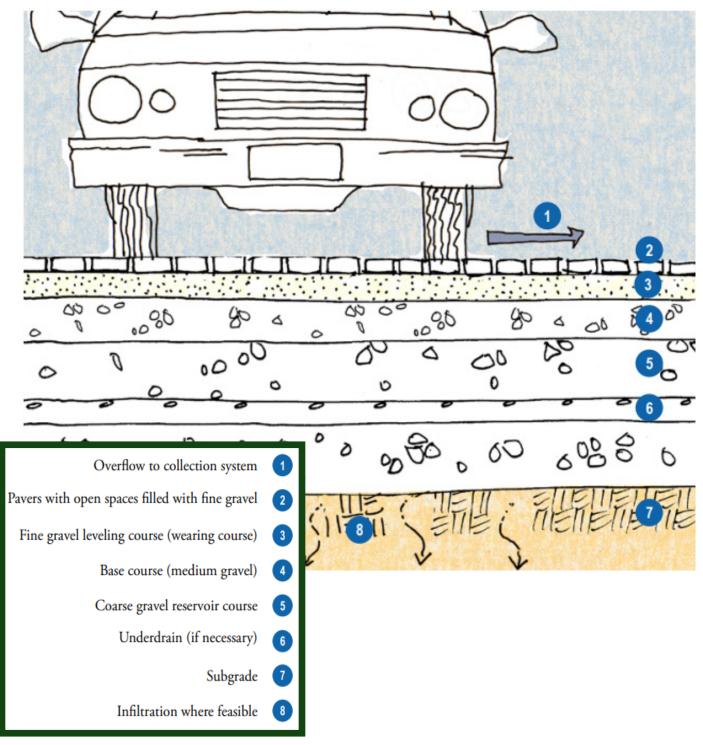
Cross-section diagram of permeable pavers. Source: SFPUC Best Management Practice Fact Sheets
